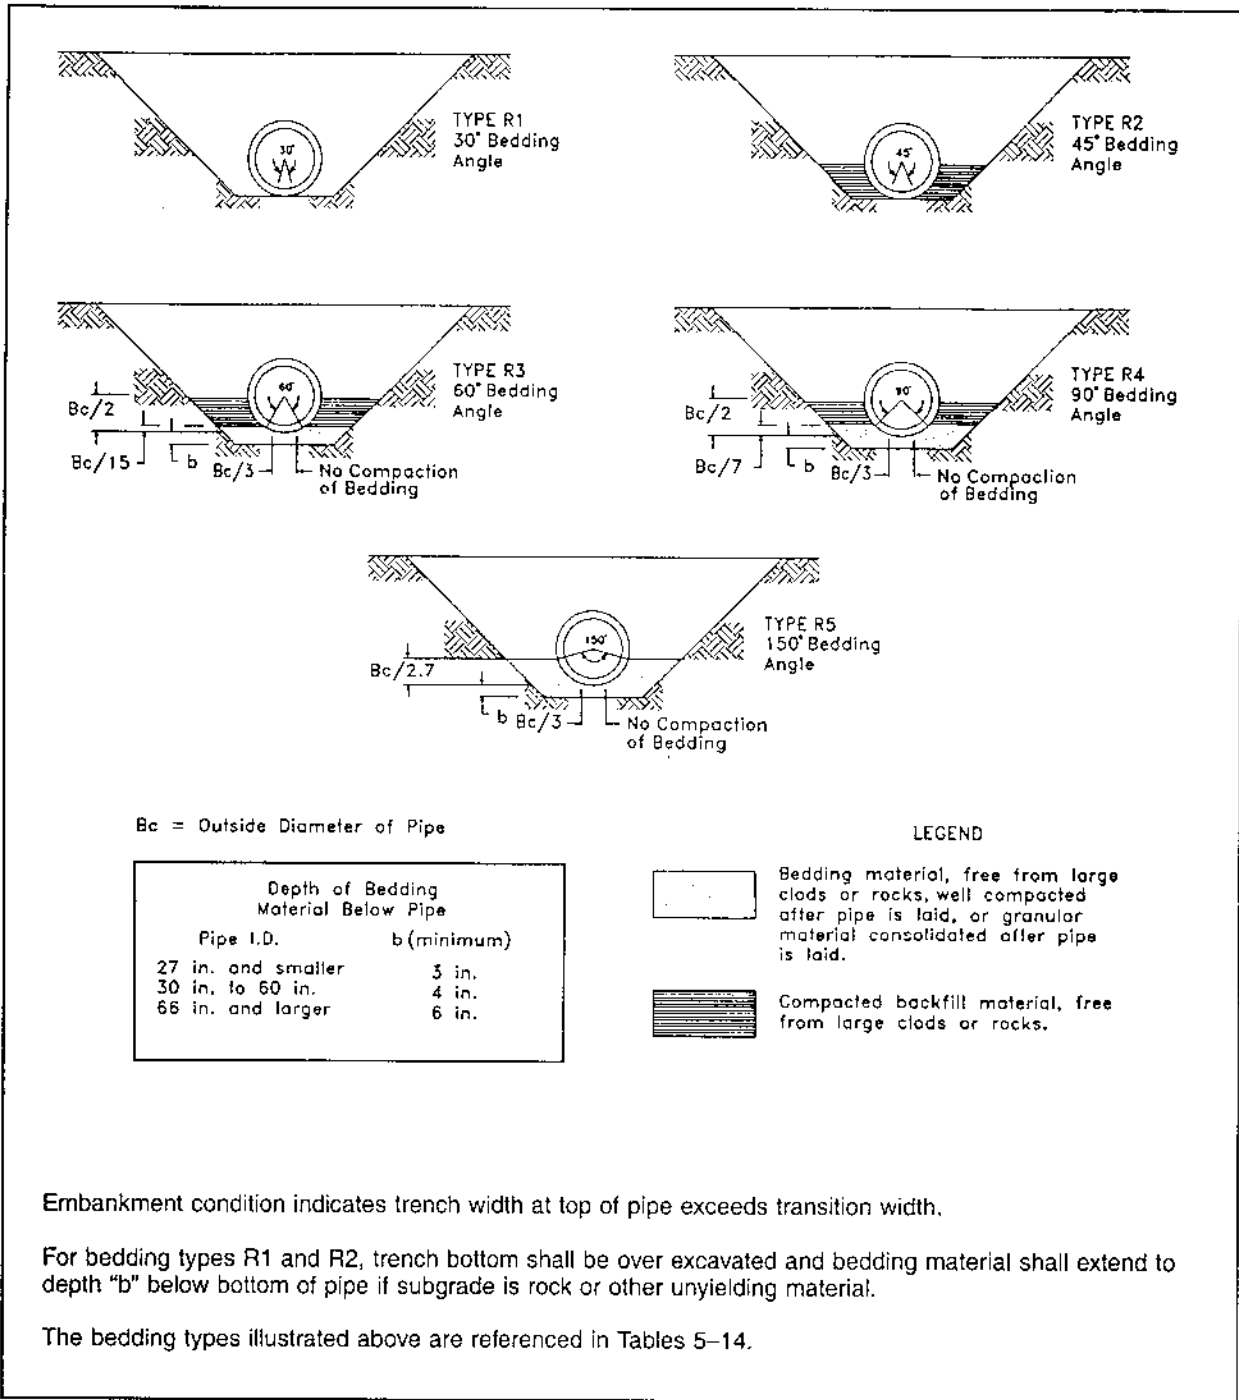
Bedding details for prestressed concrete cylinder pipe embankment condition
